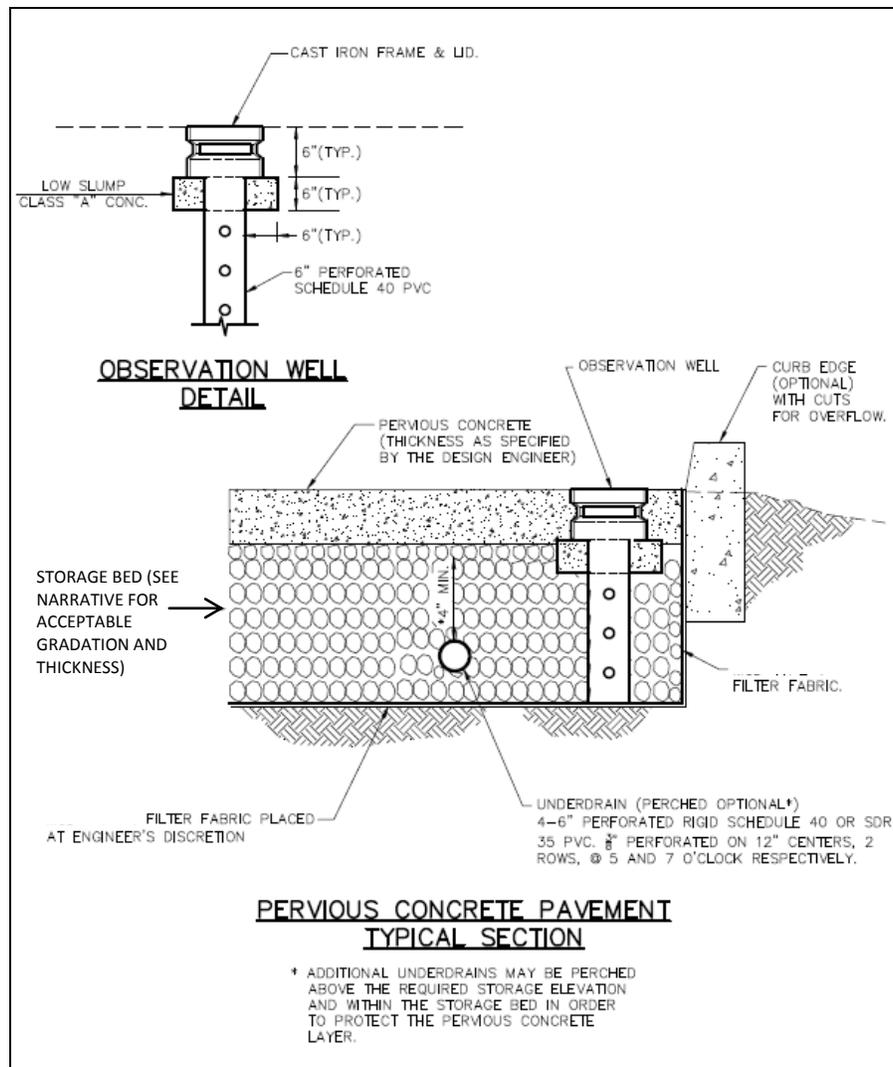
Typical pervious concrete section (Source: St. Louis MSD, 2014).
